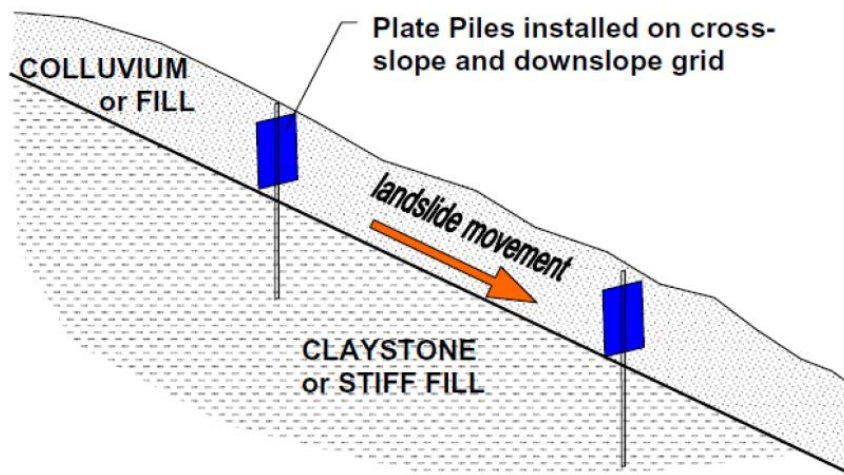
Slope stabilization using plate pile (Short and Collins, 2006)
